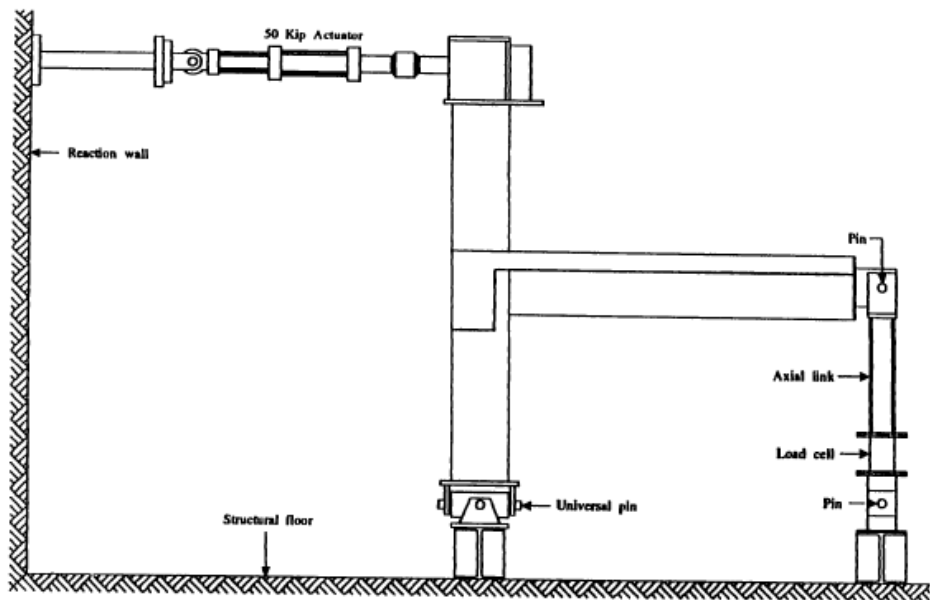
Test Setup - Specimens of LaFave and Wight
